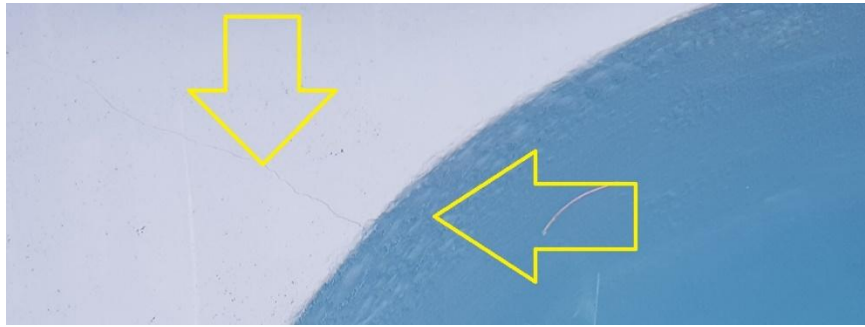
Structural crack on step inside and resulting blisters in the riser below.
